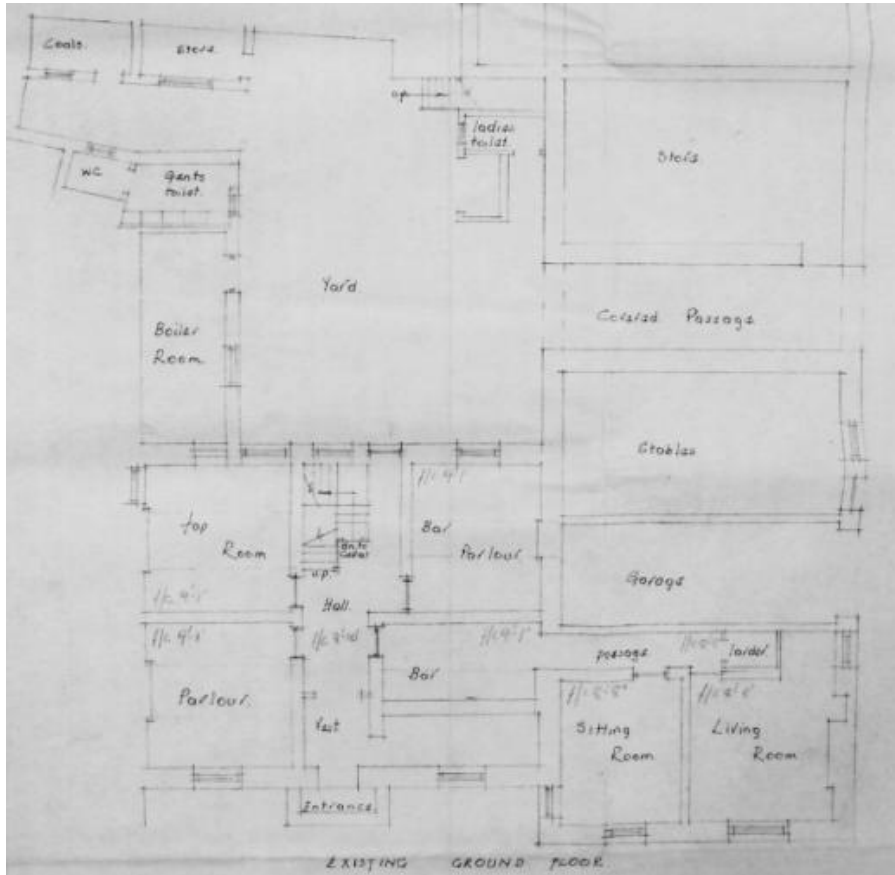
Ground floor plan drawn in 1962 prior to alteration
